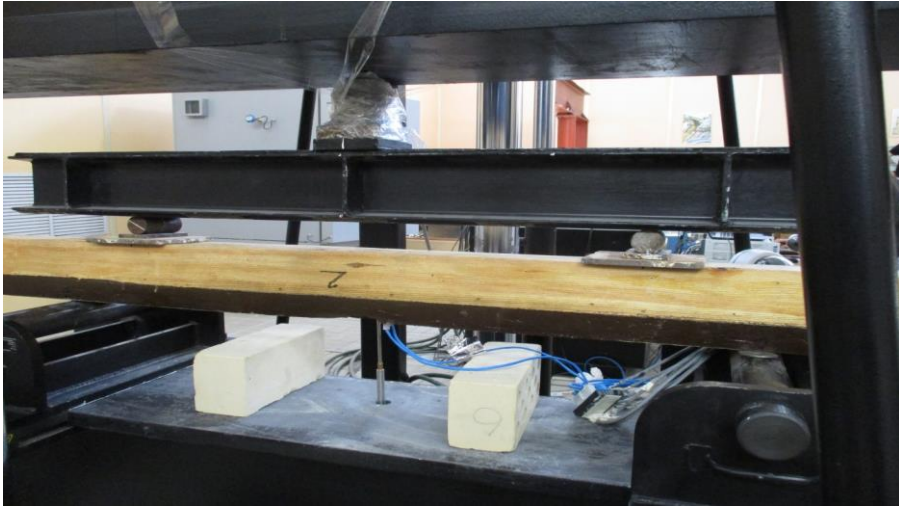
Loading scheme of a wood-rubcon reinforced composite bridge beam.
